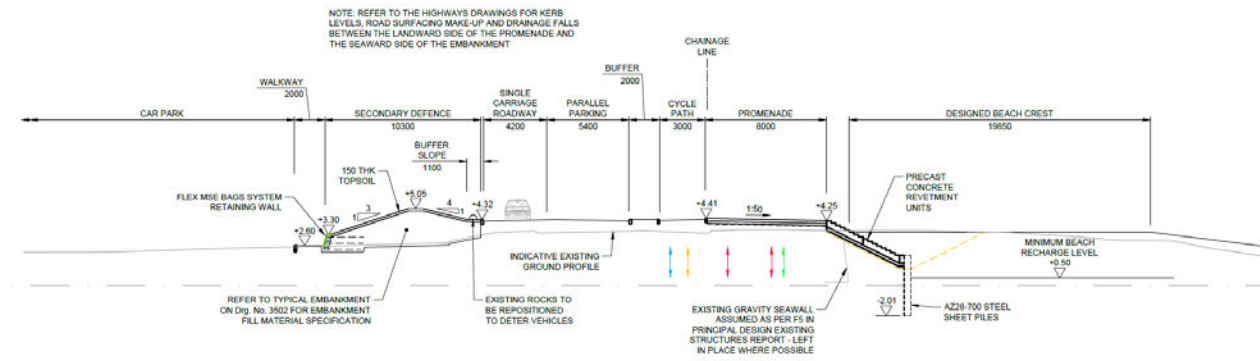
Typical cross-section of the stepped pre-cast concrete revetment at sub-frontage 3.
